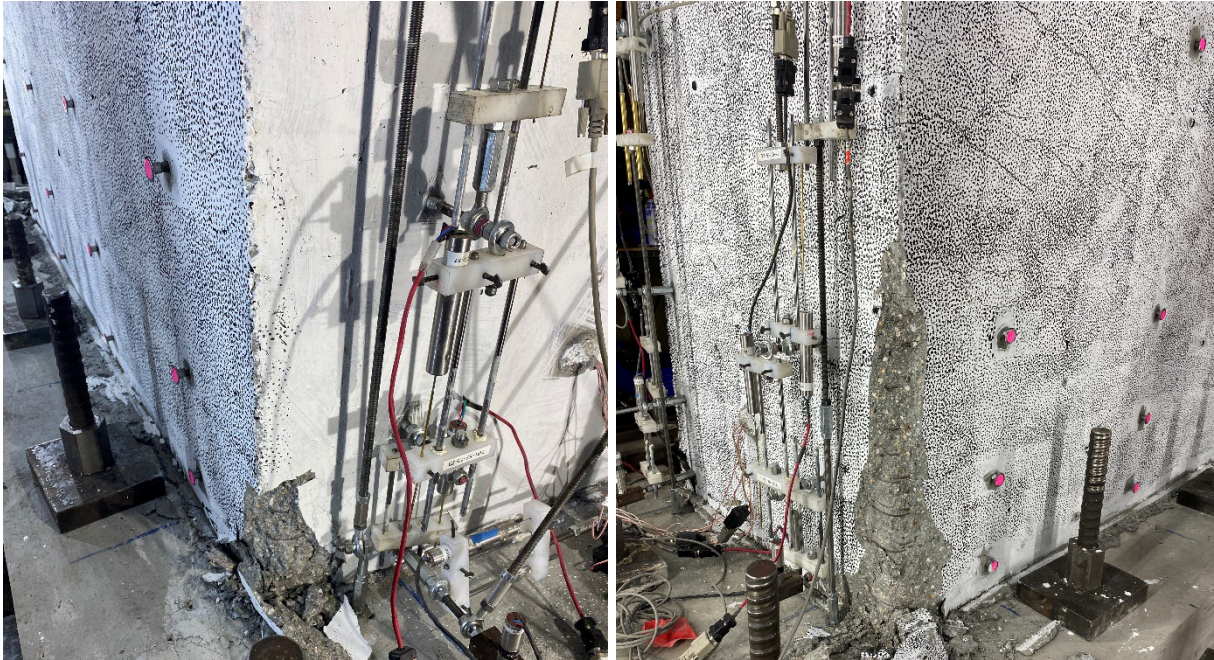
East flange corner (left) and West flange corner (right) after the ramp-up loading of WLP, CW-4
